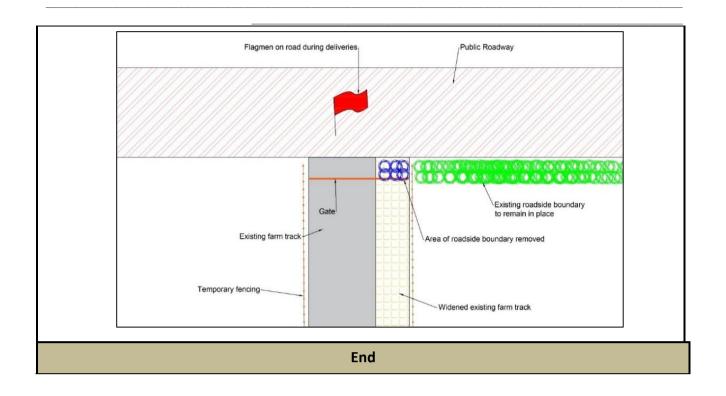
Plan View of Typical Temporary Site Entrance
